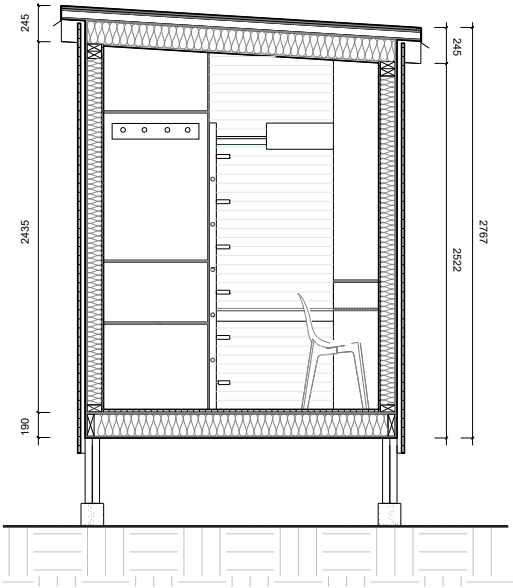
SECTION C-C OF THE BUILT CABIN.
